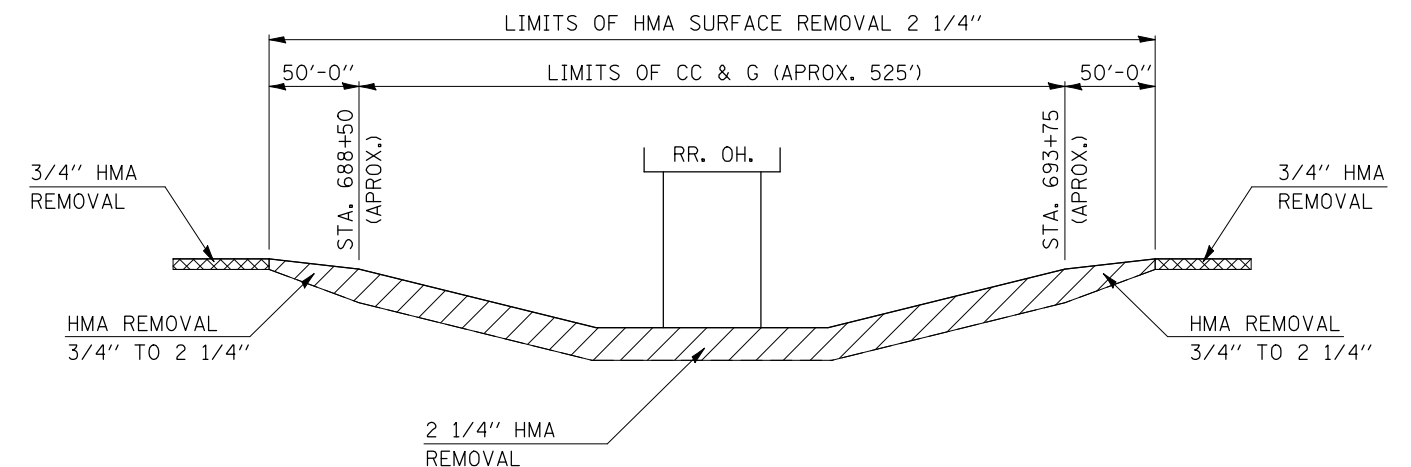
DETAIL OF HMA SURFACE REMOVAL 2 1/4" &
